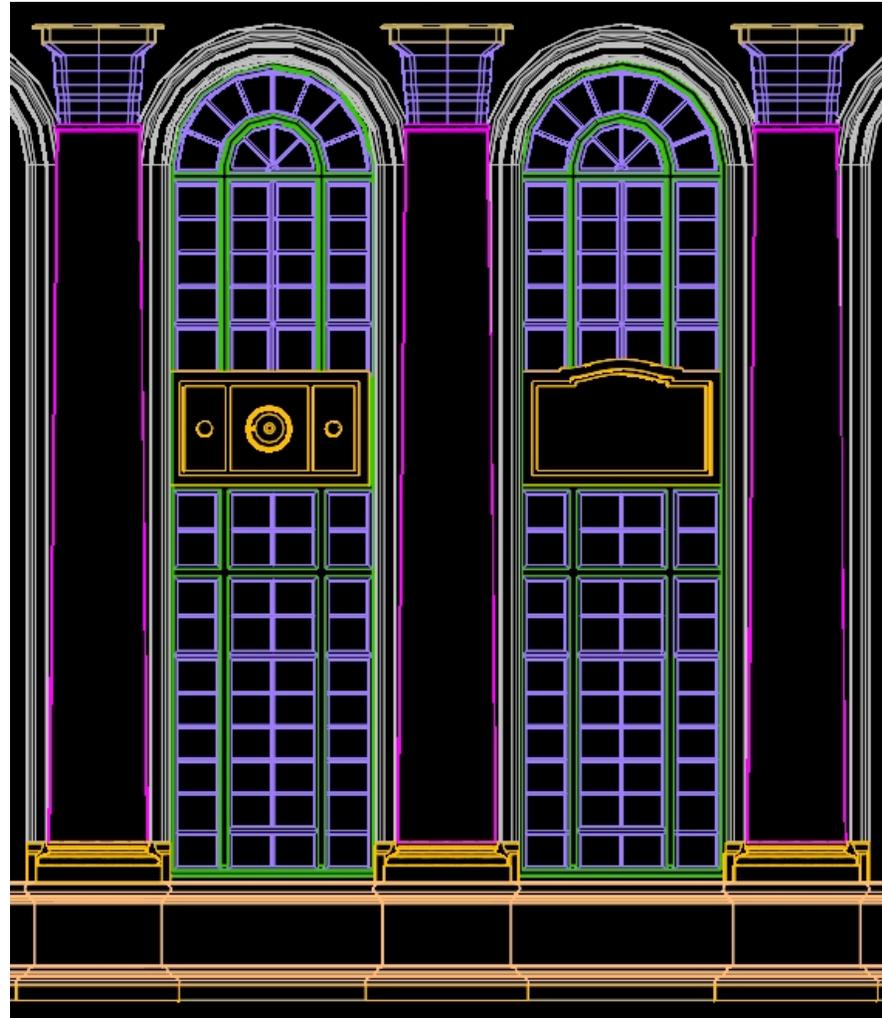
Third example of an Elevation. (Courtesy of Arcadis)
